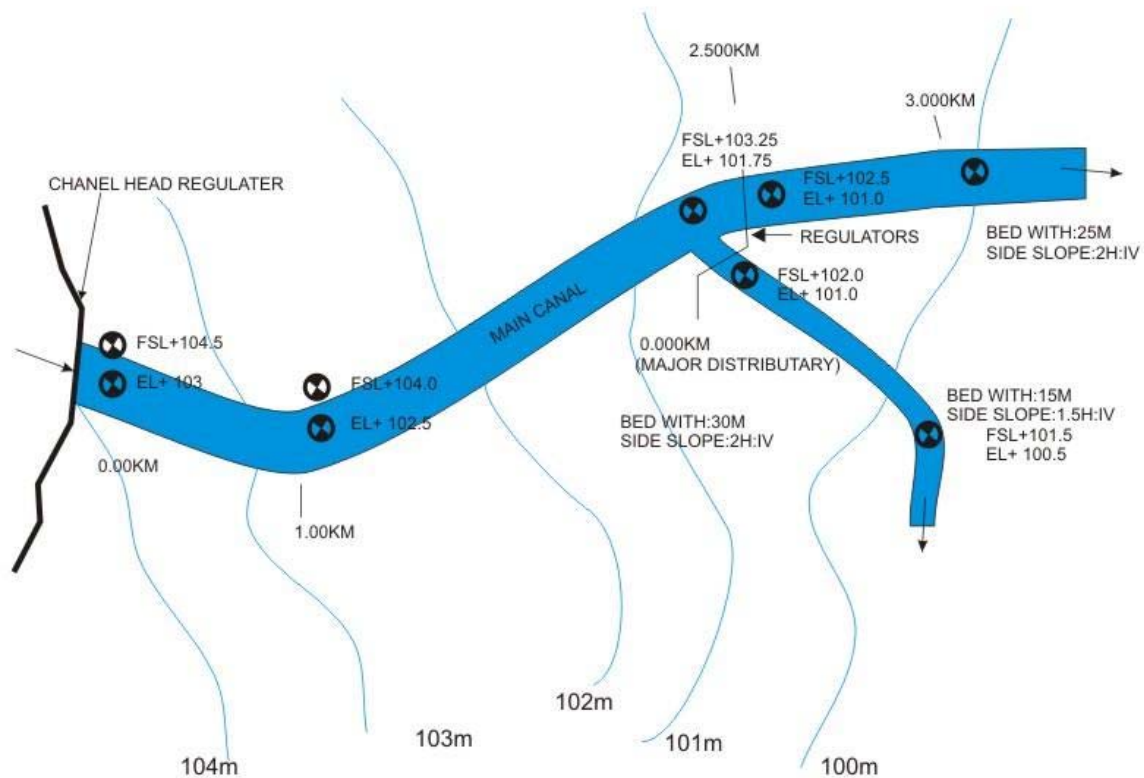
Typical layout of a canal showing bed and canal full supply levels
